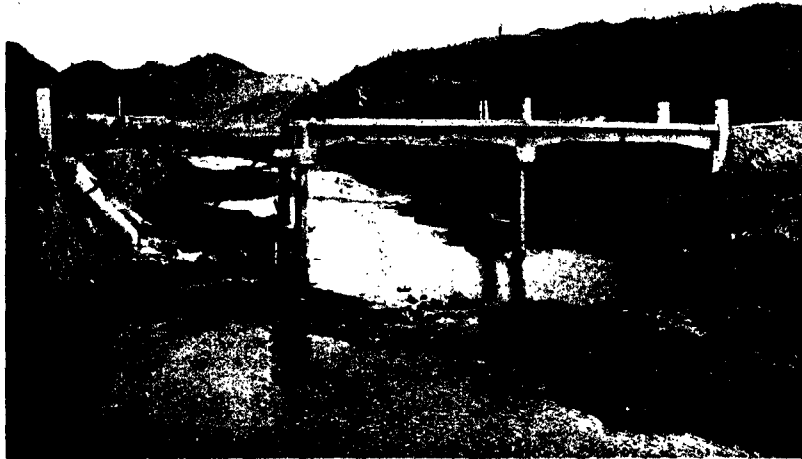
A reinforced-concrete bridge with T-beam deck (0.44 mile from ground zero at Nagasaki). Part of deck was knocked off the pier and abutment by the blast, causing one span, 35 feet long, to drop into the river. The remainder of the bridge was almost undamaged.
